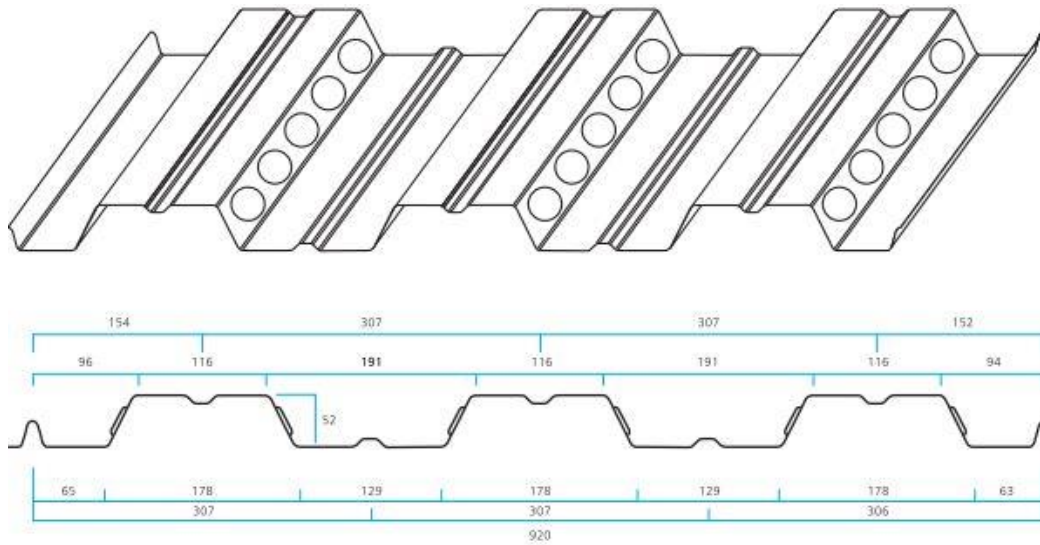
Features of ATAPANEL Composite Flooring Sheet
